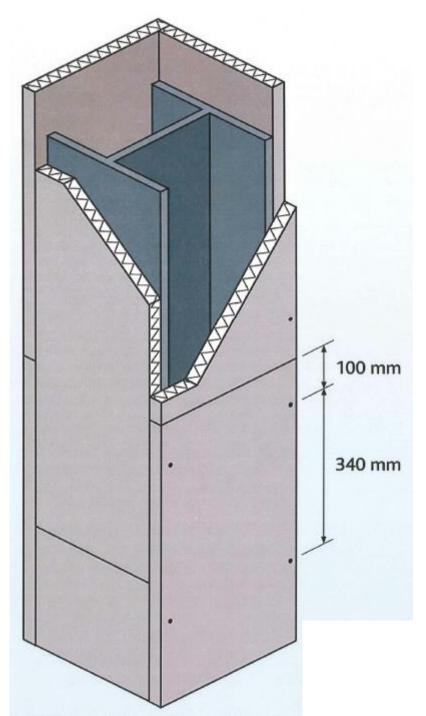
Position of screws in open profiled steel – four sided Screws 3.8×45 mm used for 25 mm fire protection Screws 5.0×90 mm used for 50 mm fire protection
